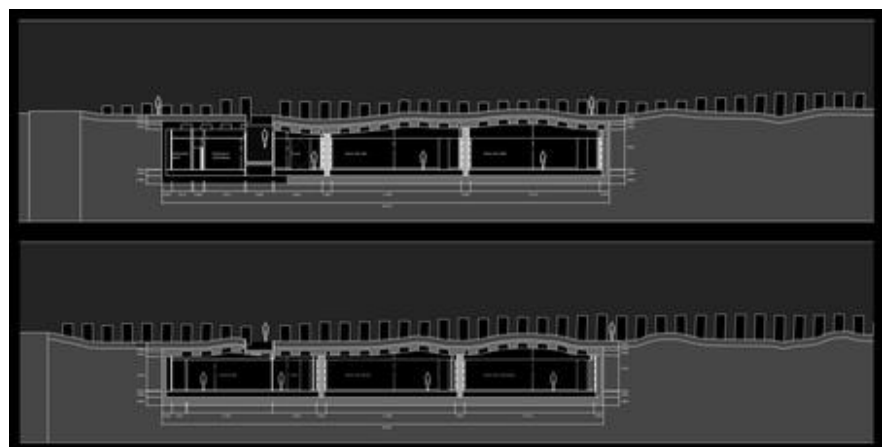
Peter Eisenman. BERLIN MEMORIAL TO THE MURDERED JEWS OF EUROPE, Sections
